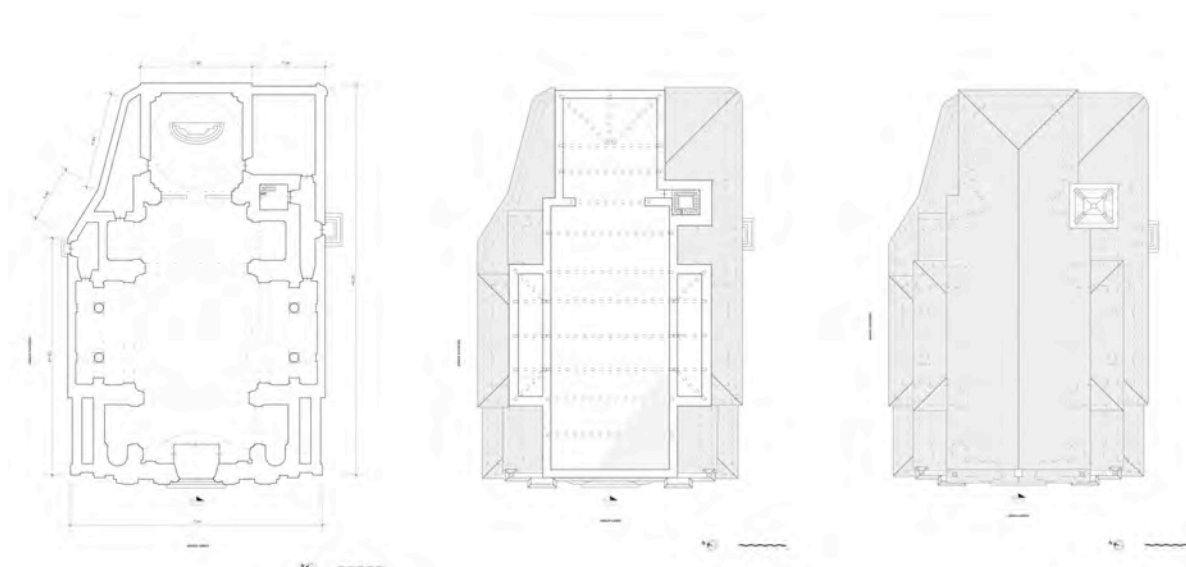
Plant ground floor, plant of the attic and plant roof of the building. Survey drawings of the author
